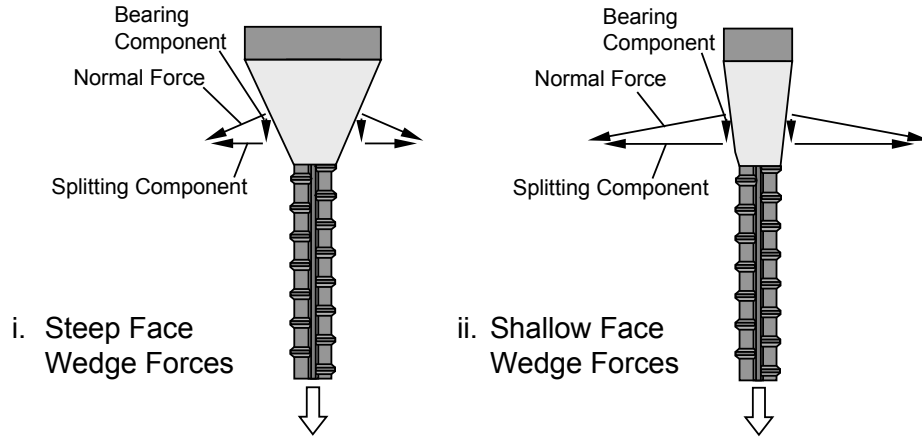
Transverse splitting components of shallow and steep wedge face bearing
